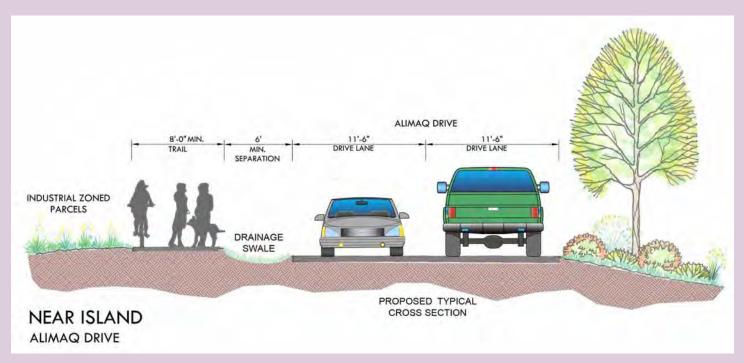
Alimaq Drive Proposed Typical Cross-Section Looking Northeast
